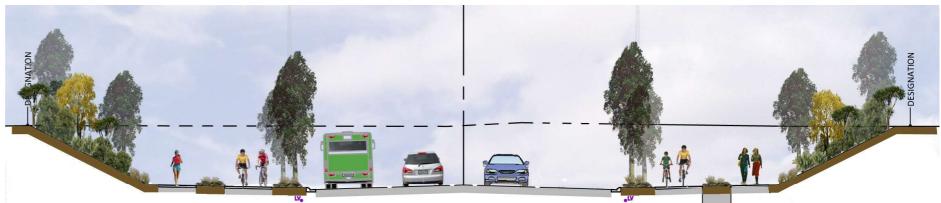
TYPICAL RING ROAD EXTENSION CROSS SECTION
